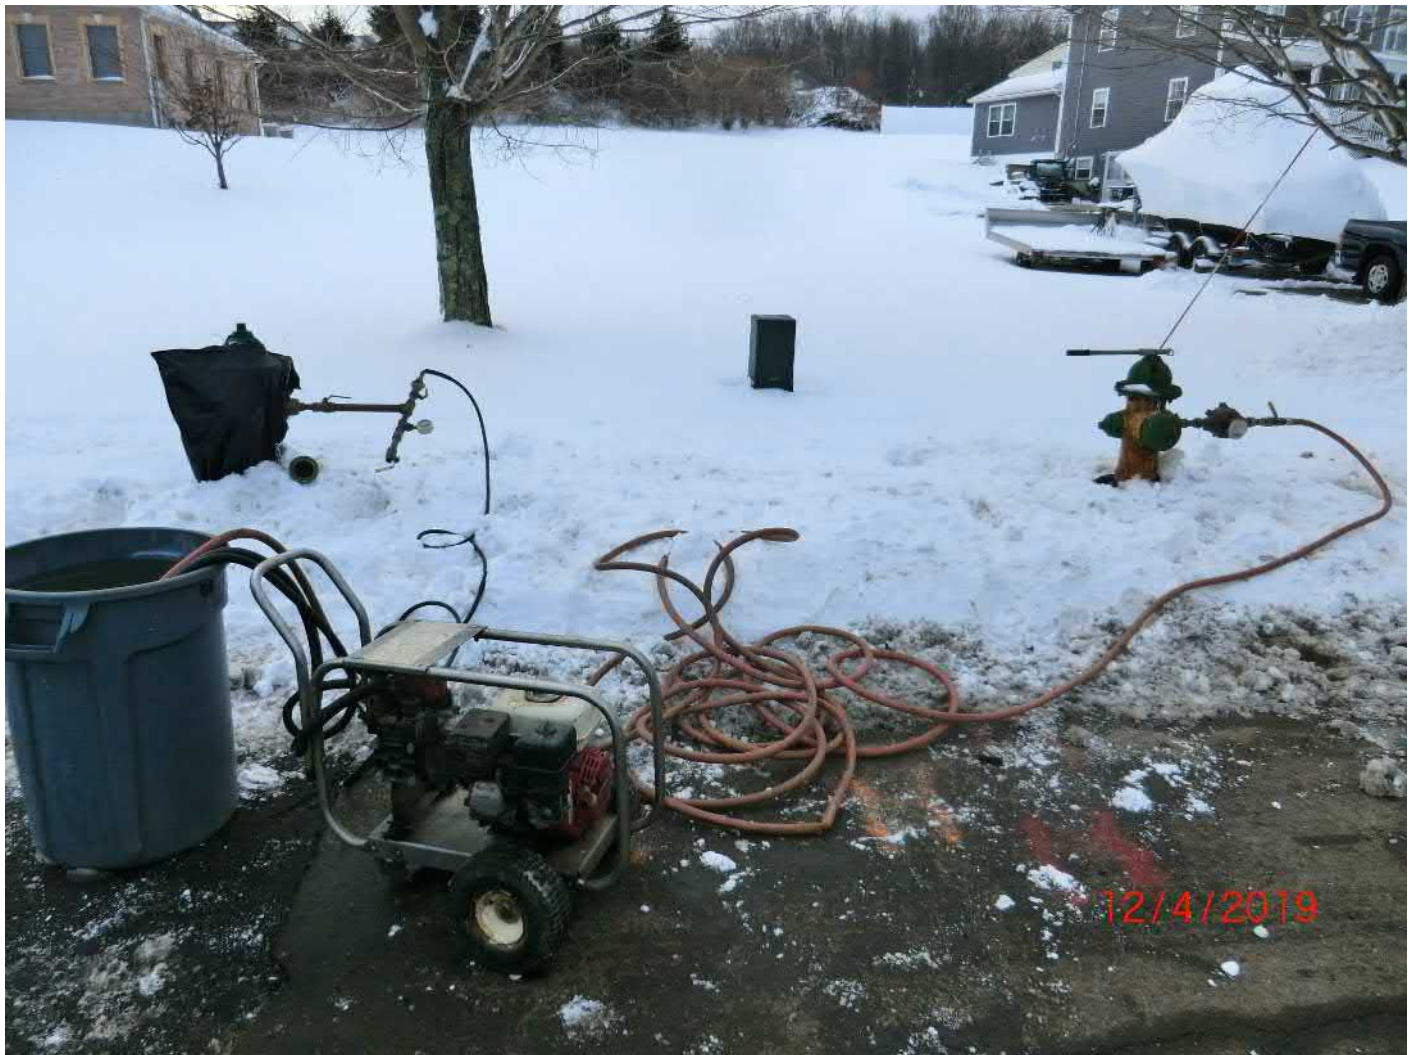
Facing south midway between lower and upper Watch Hill Dr. on Talcott Ridge Dr. Taking water from existing hydrant and pumping into new water line through new hydrant. Part of the testing procedure.
